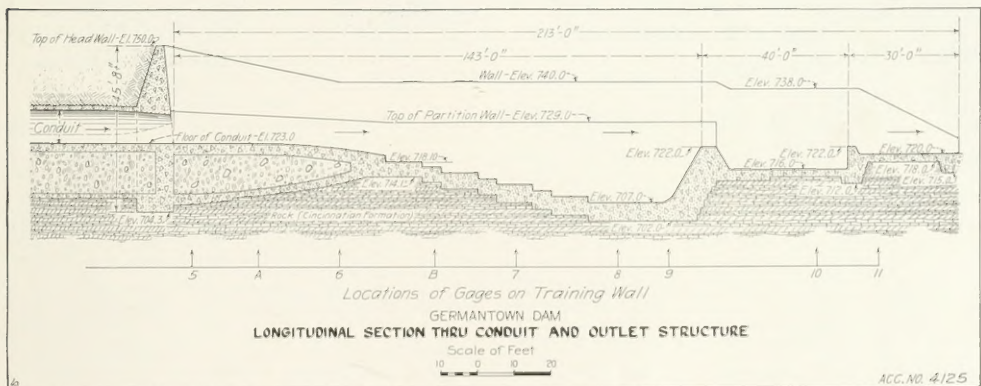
LONGITUDINAL SECTION THROUGH GERMANTOWN DAM CONDUIT AND OUTLET
